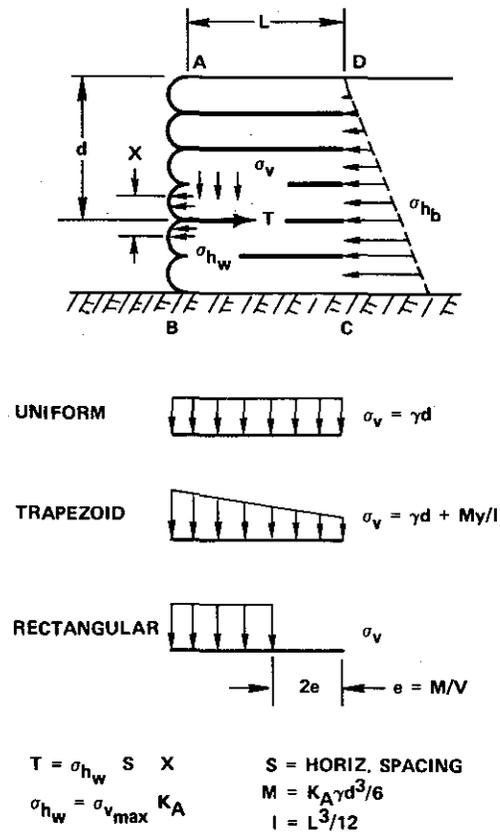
Original LCPC basis for static design of a reinforced earth wall
